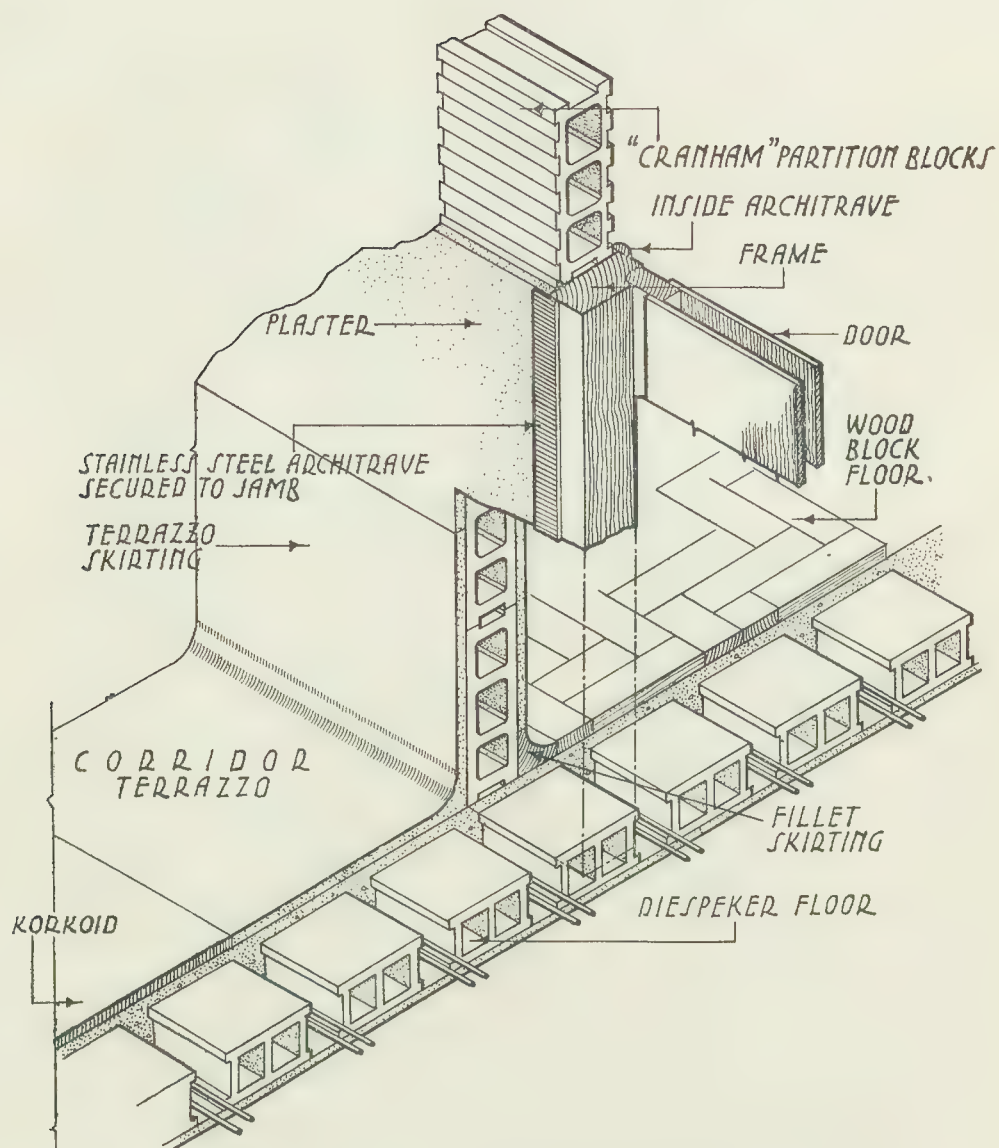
CONSTRUCTION OF HOLLOW BLOCK PARTITION WALL
